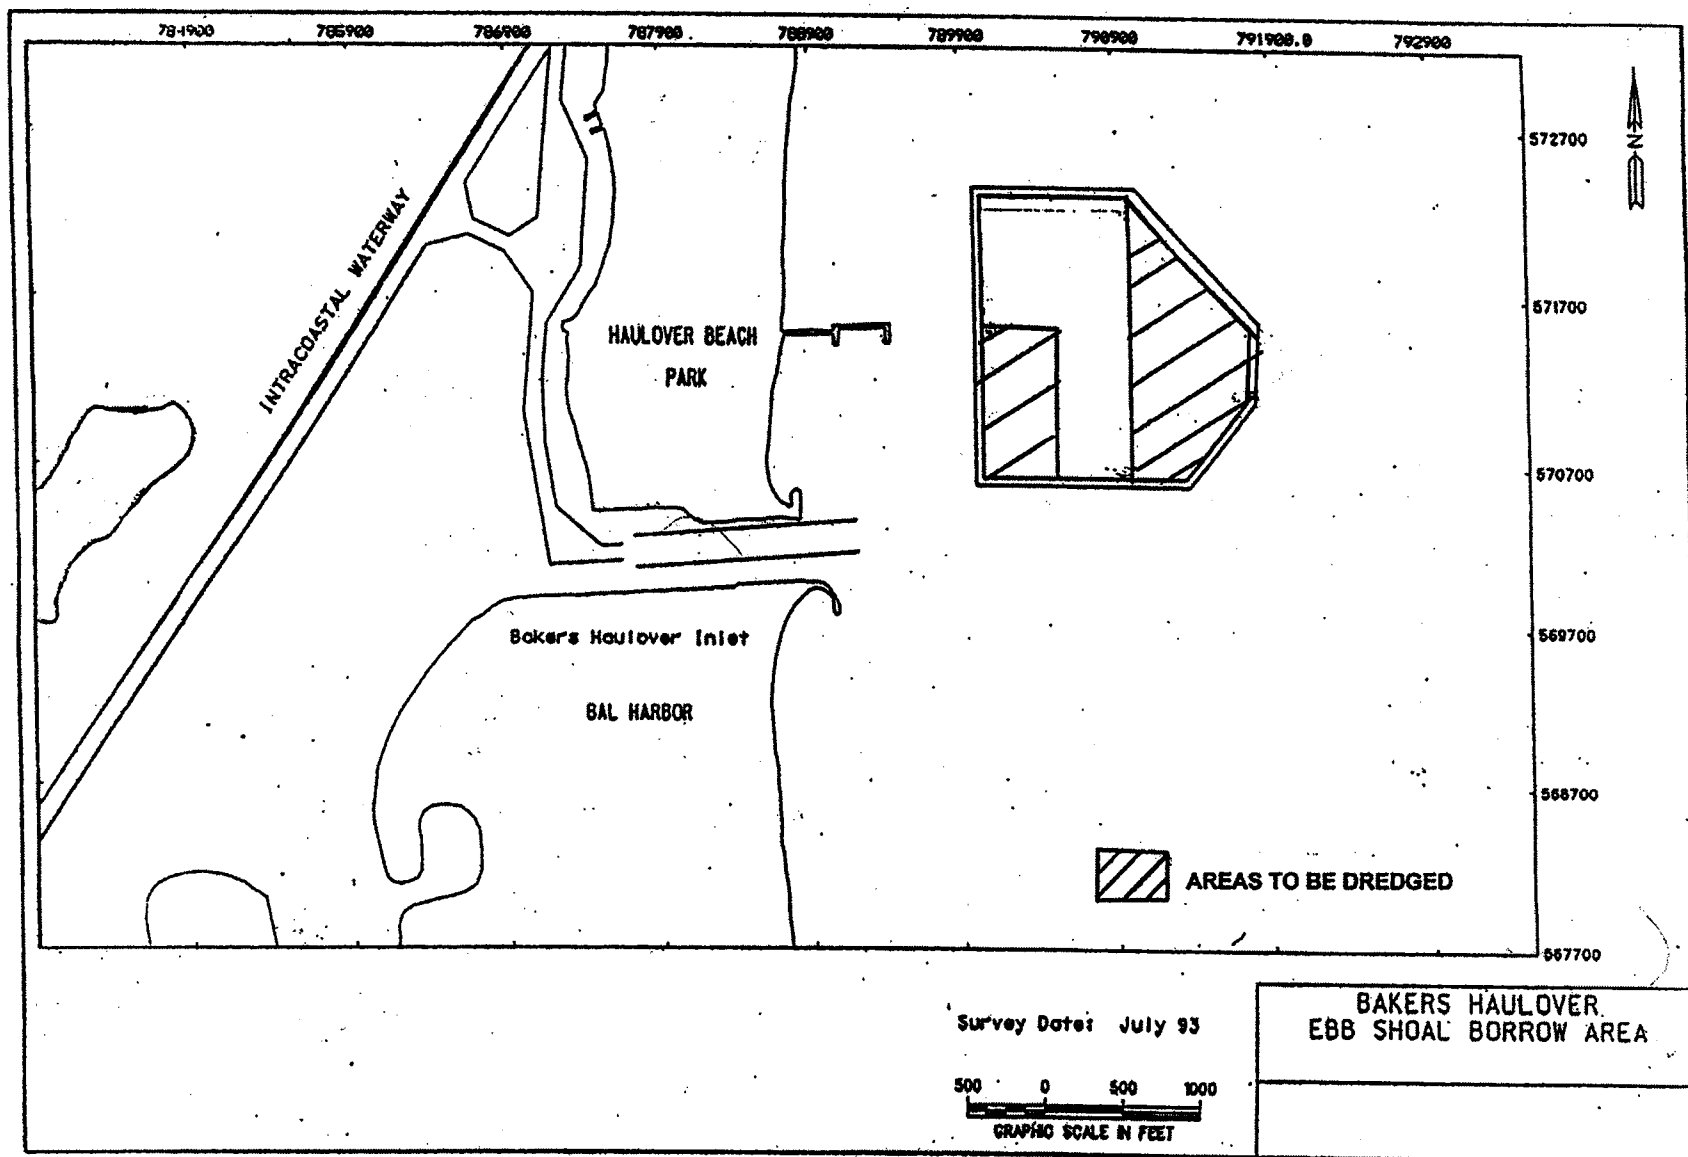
Proposed Borrow Area, Ebb Shoal at Bakers Haulover Inlet
